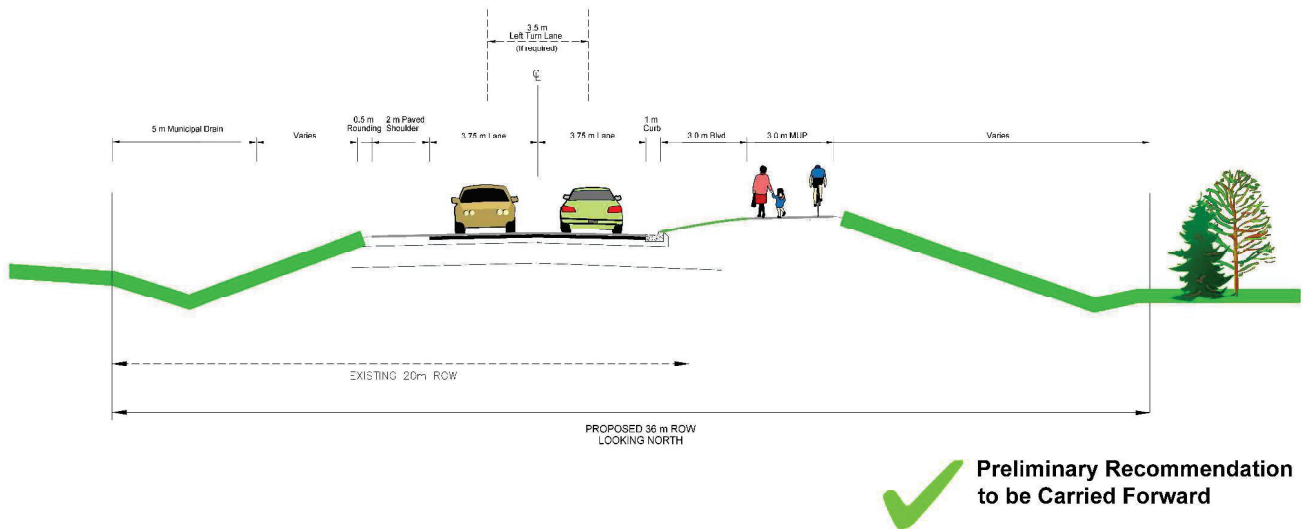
Concession Road 8 and 9 Technically Recommended Cross Section
